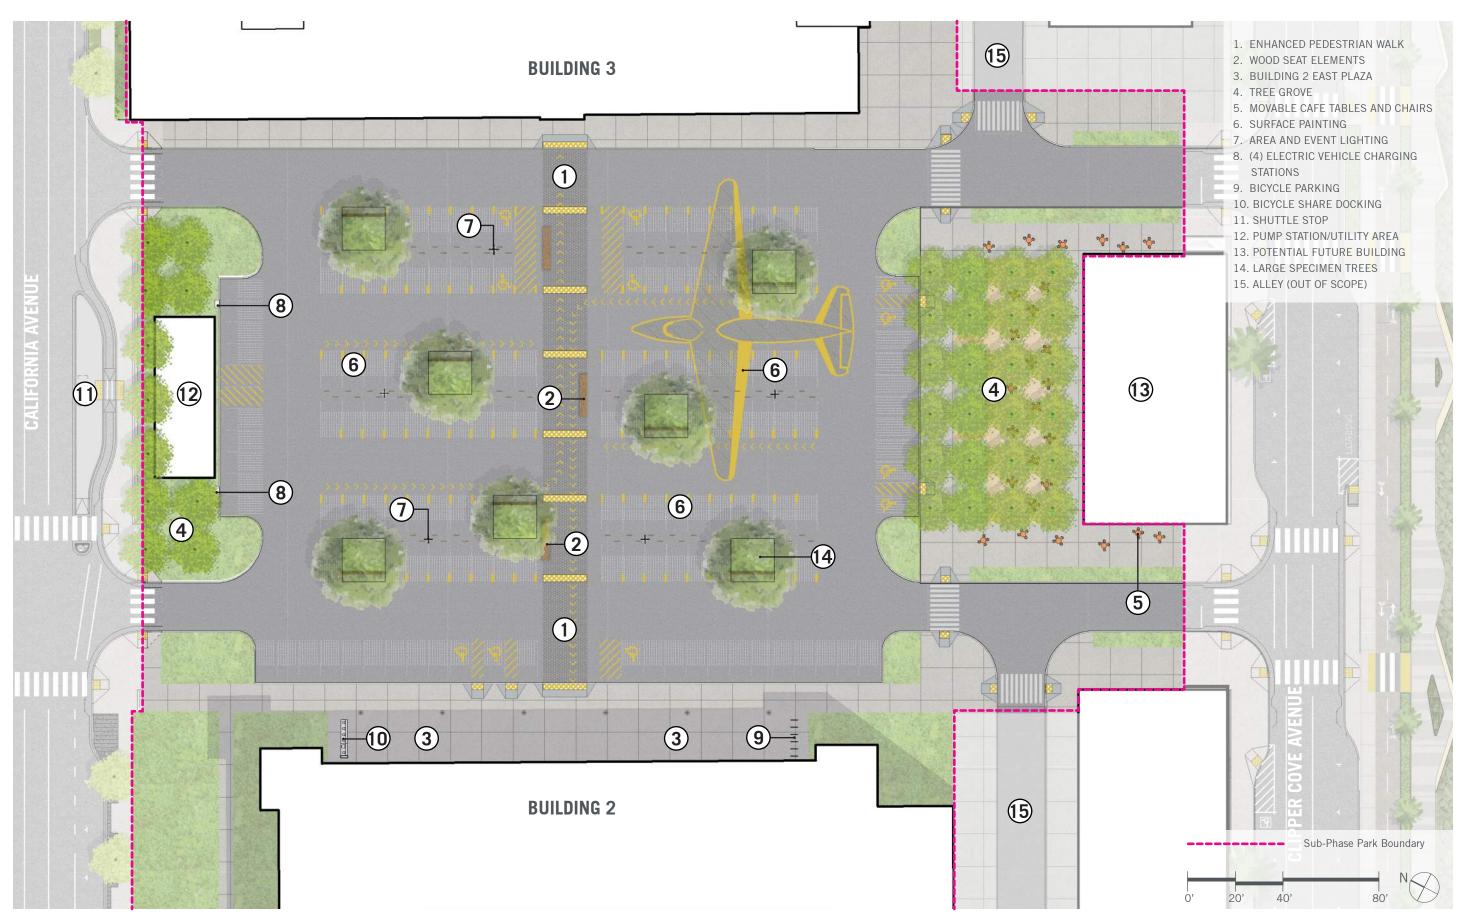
BUILDING 3 WEST SIDE OPEN SPACE ILLUSTRATIVE PLAN
